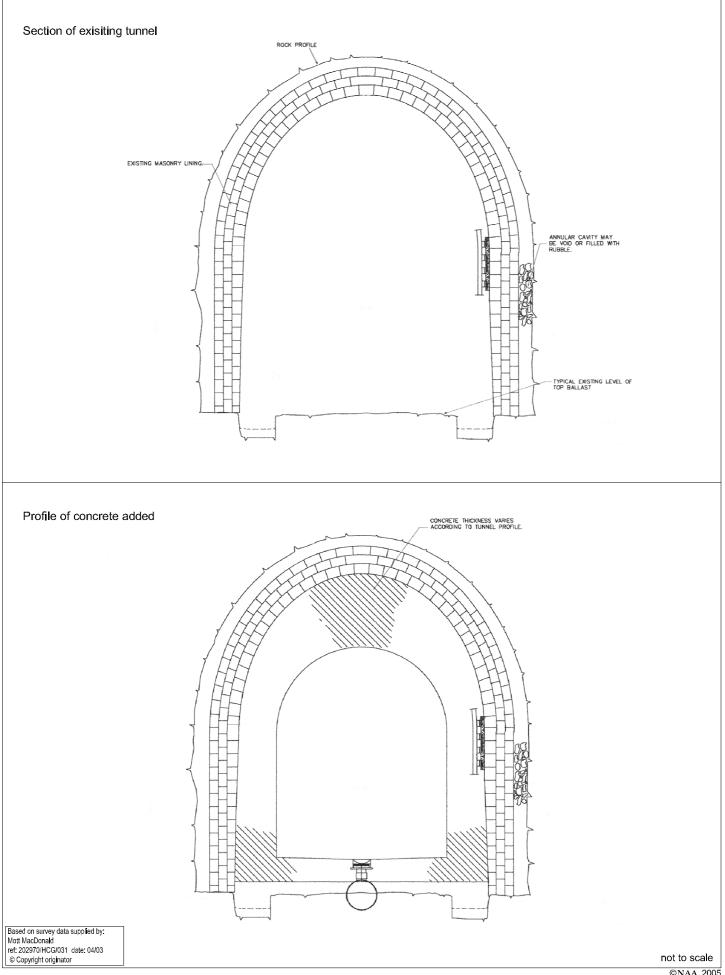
Woodhead Tunnel: general arrangement of south tunnel
